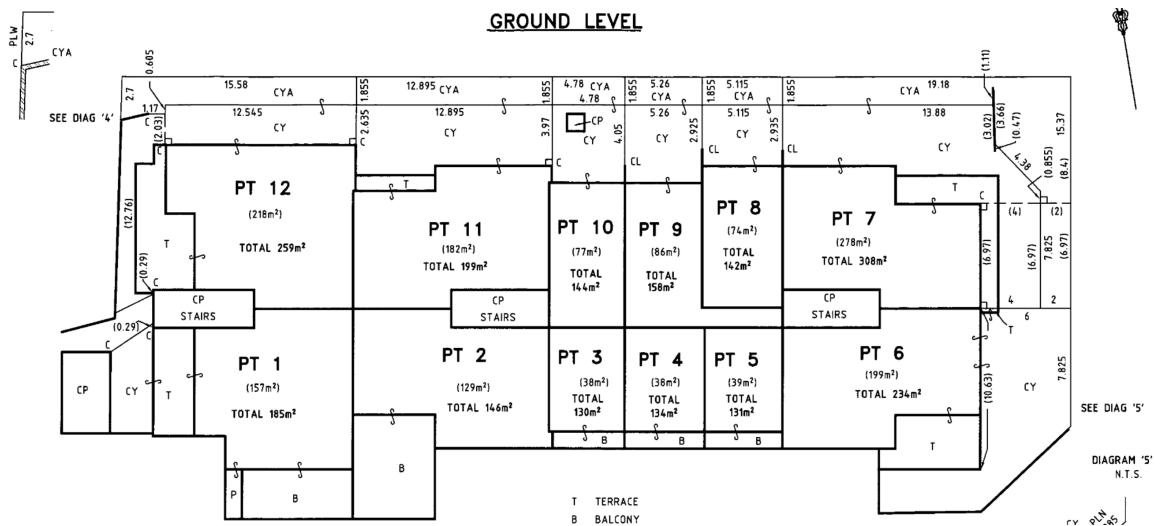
Strata Ground Plan of 23B-27 Pine Avenue
